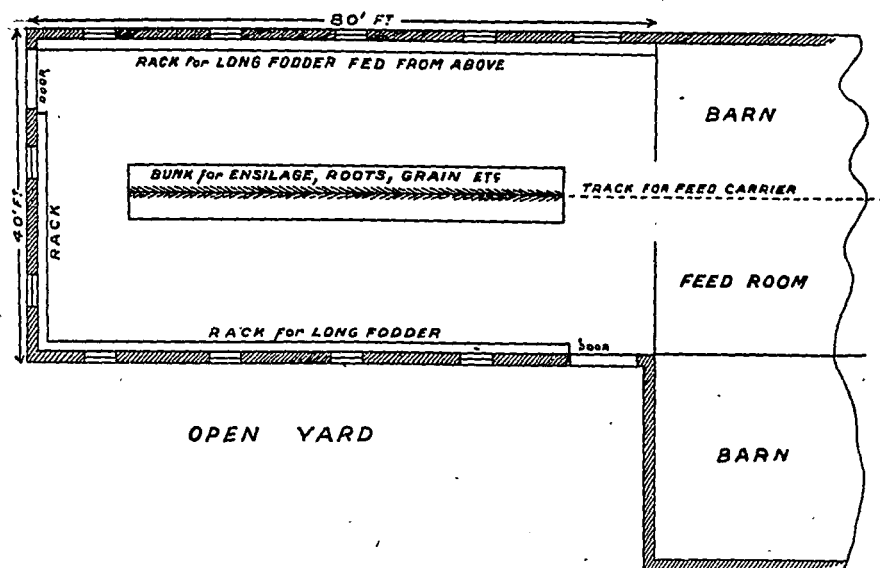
GROUND PLAN OF SHED FOR LOOSE FEEDING, OWNED BY GEO. P. BARRIE.
